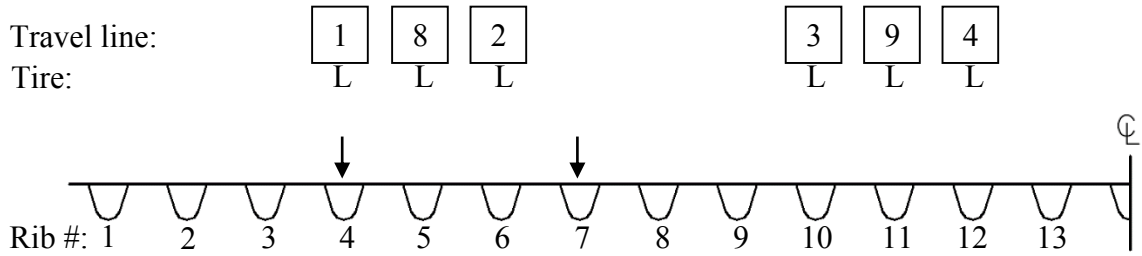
North side of bridge, static positions; wheel loads shown for longitudinal travel line 1.
